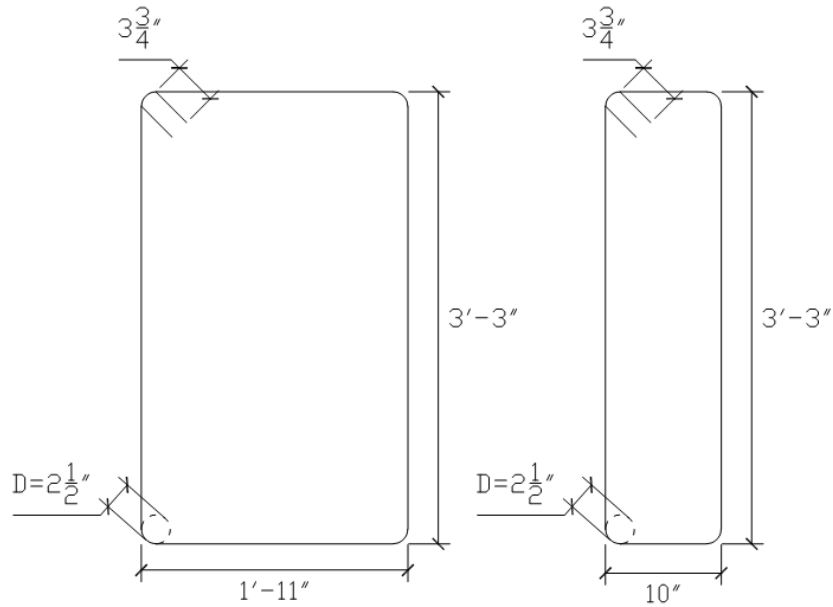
Dimensions of stirrups for Specimens 8 and 9
